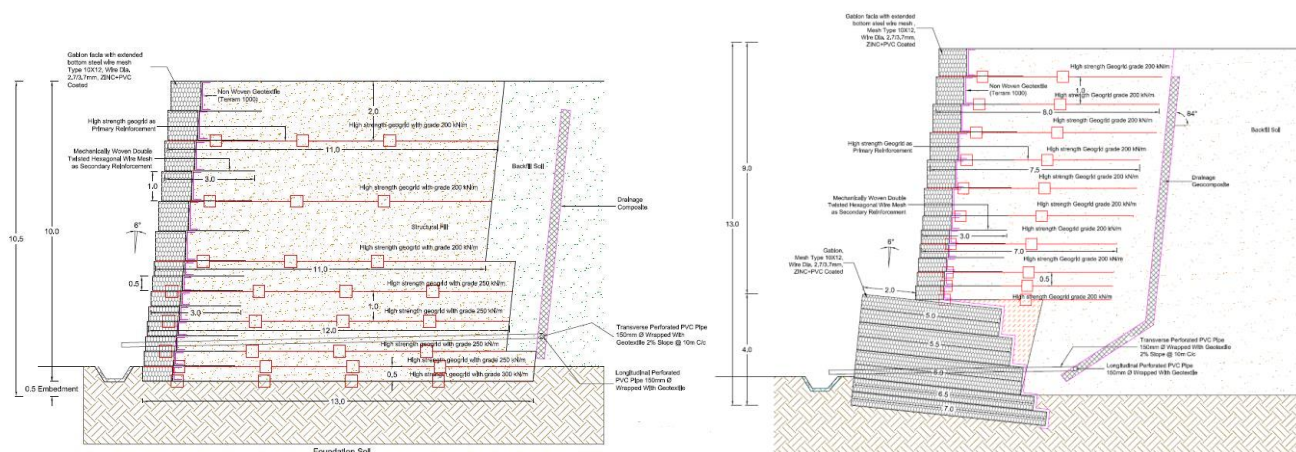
Typical cross section of 10 m high composite reinforced soil system (b) typical cross section of 13 m high gabion and composite reinforced soil system
